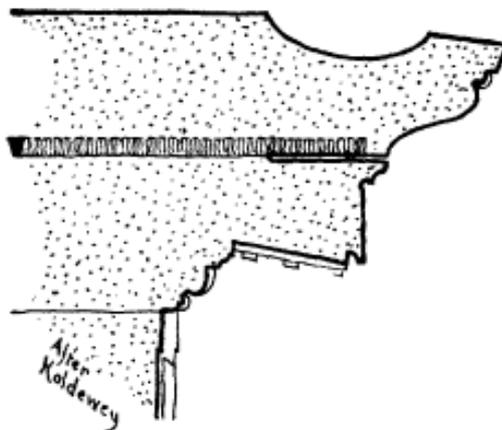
Iron supporting stone cantilever at cornice at temple of Castor and Pollux at Acragas [27].
